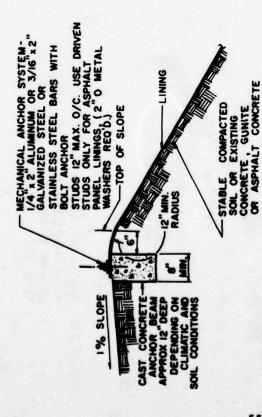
Top anchor detail--alternative i, all linings (Kays, 1977). Courtesy of John Wiley & Sons, Inc., New York, N.Y.
